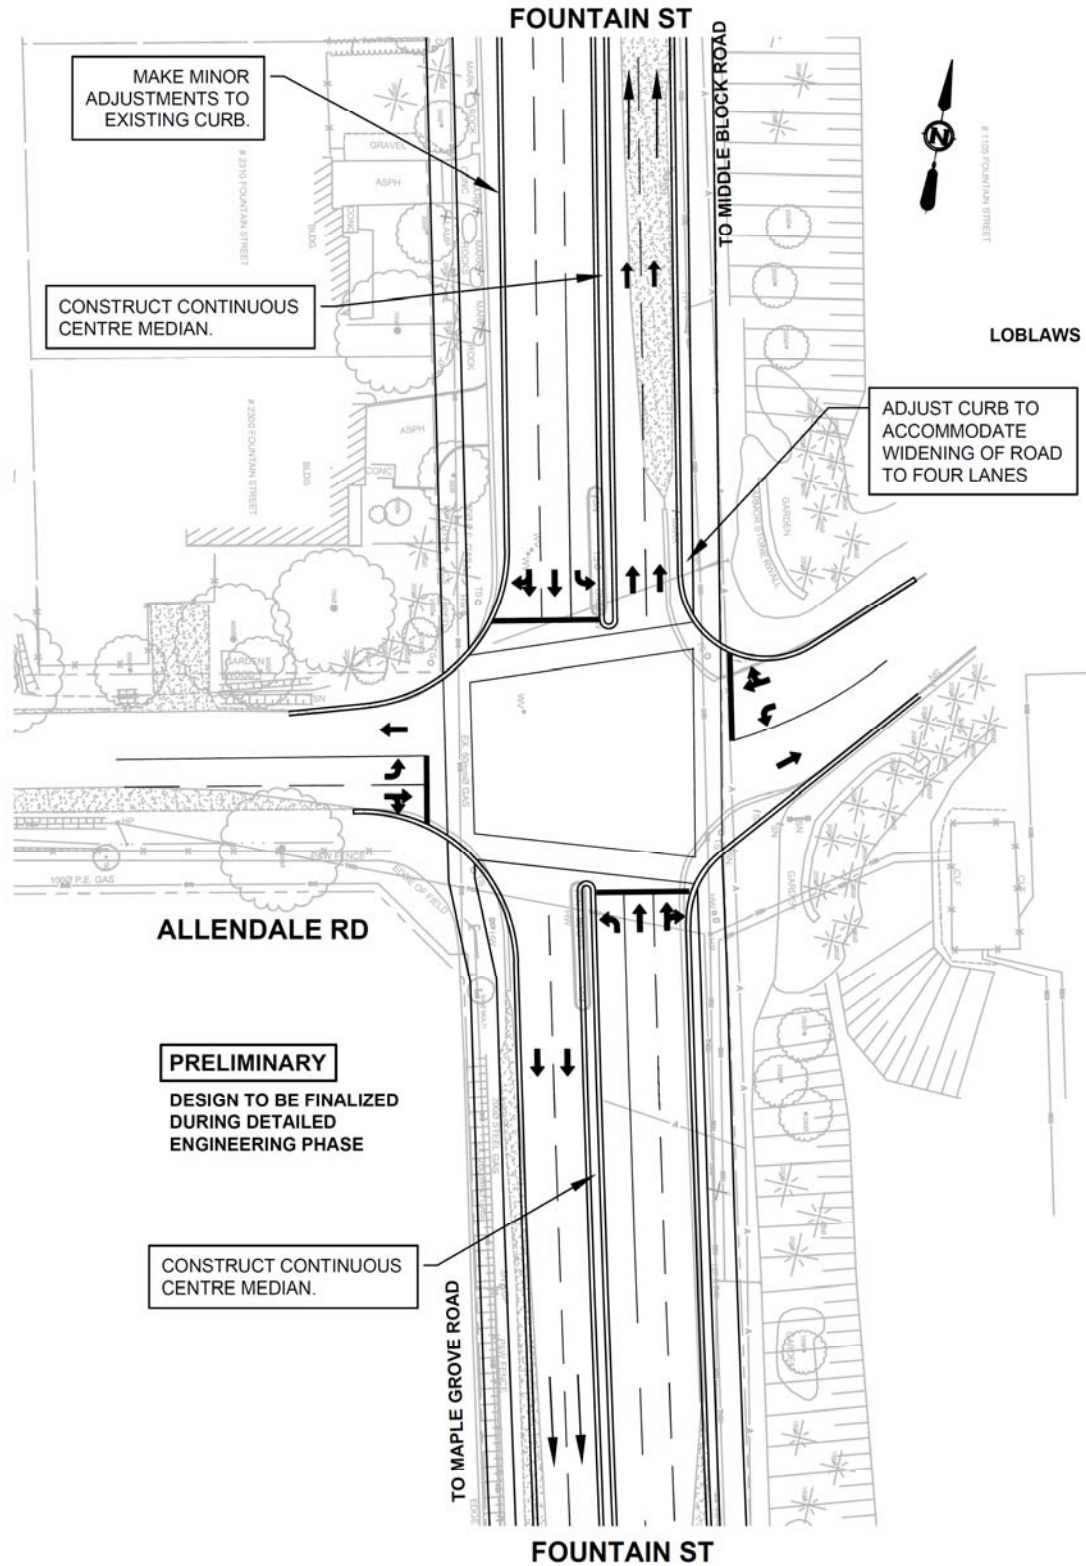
Proposed Improvements to Existing Signalized Intersection of Fountain Street and Allendale Road
